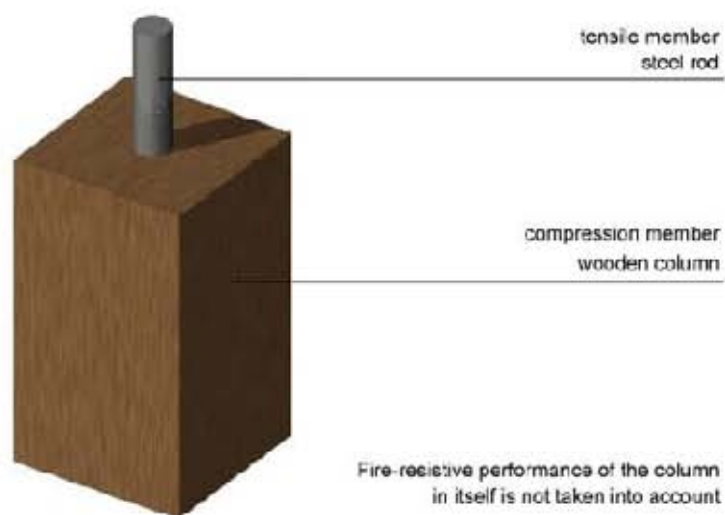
Diagram image of composite column: wooden column + steel rod
